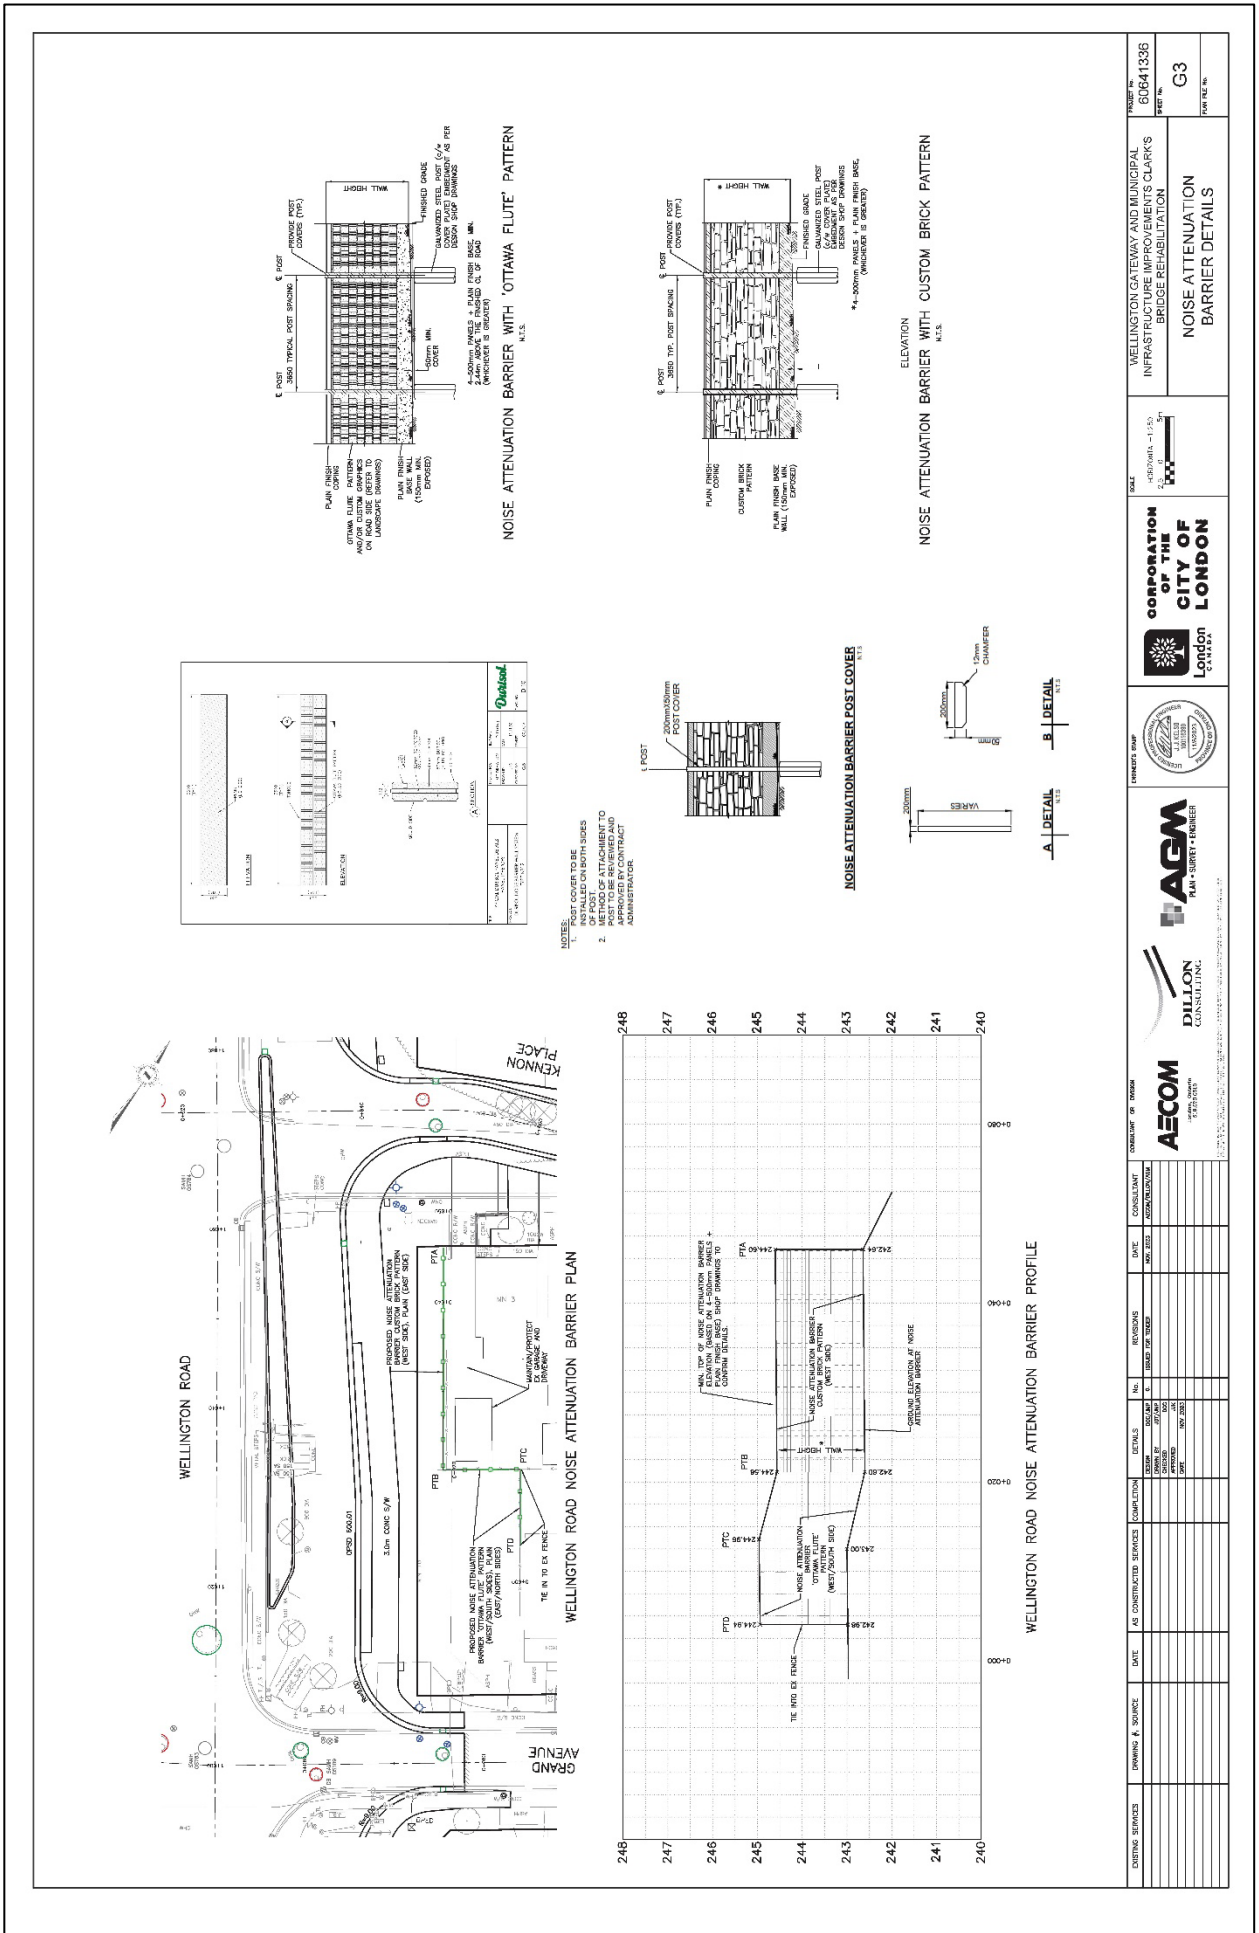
Wellington Gateway Construction Project Detail Design Drawings (AECOM, Dillon Consulting, AGM, dated November 2023).
